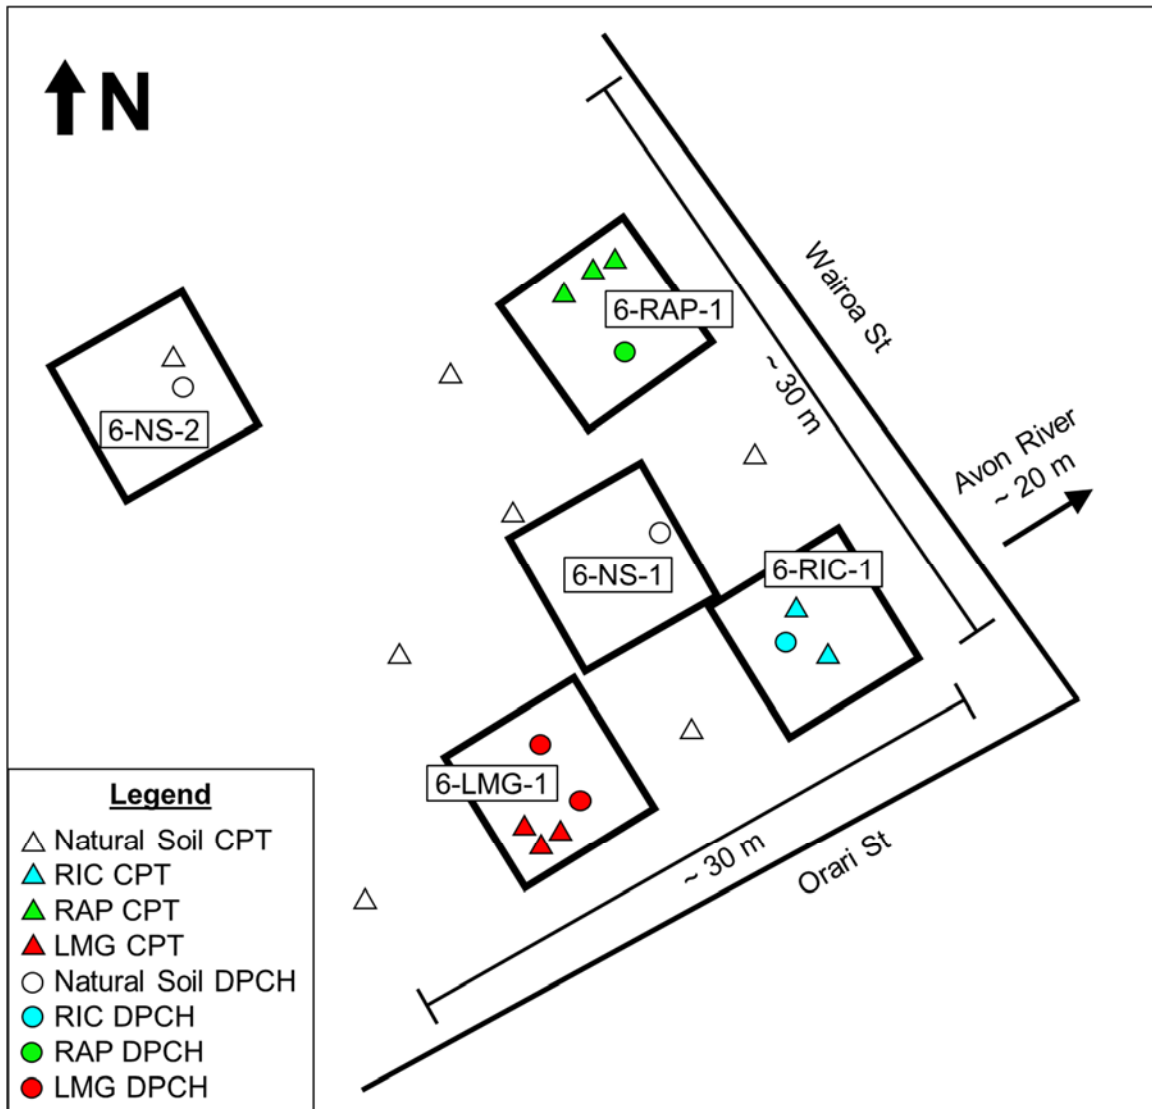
Location of CPT and DPCH tests performed at Site 6.
